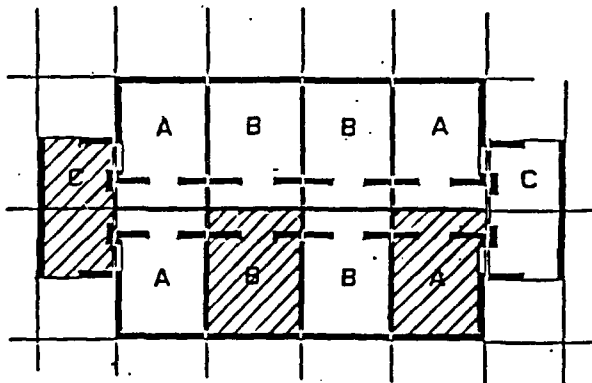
Conceptual layout and section of a single-storey aboveground REH structure.
